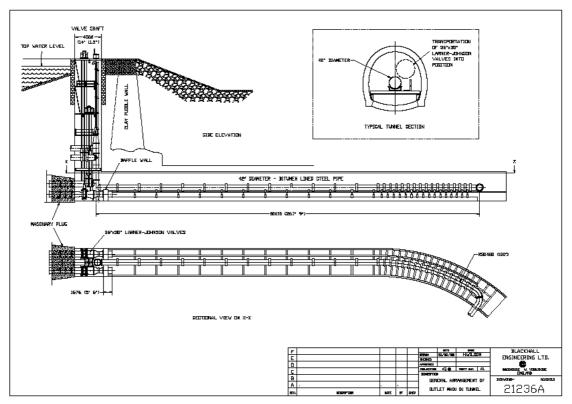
Cross sectional drawing of embankment, valve tower and discharge tunnel.
